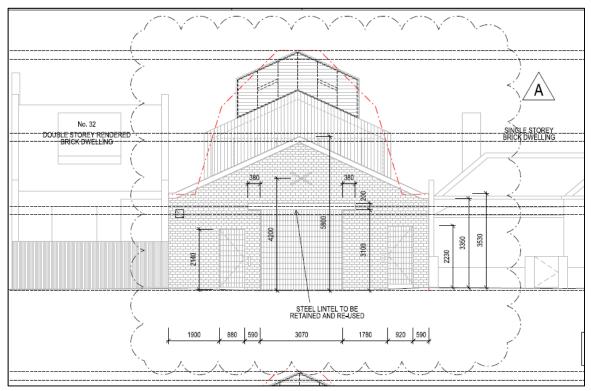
Proposed buildings and works (source: applicant submission 5/05/2017).
